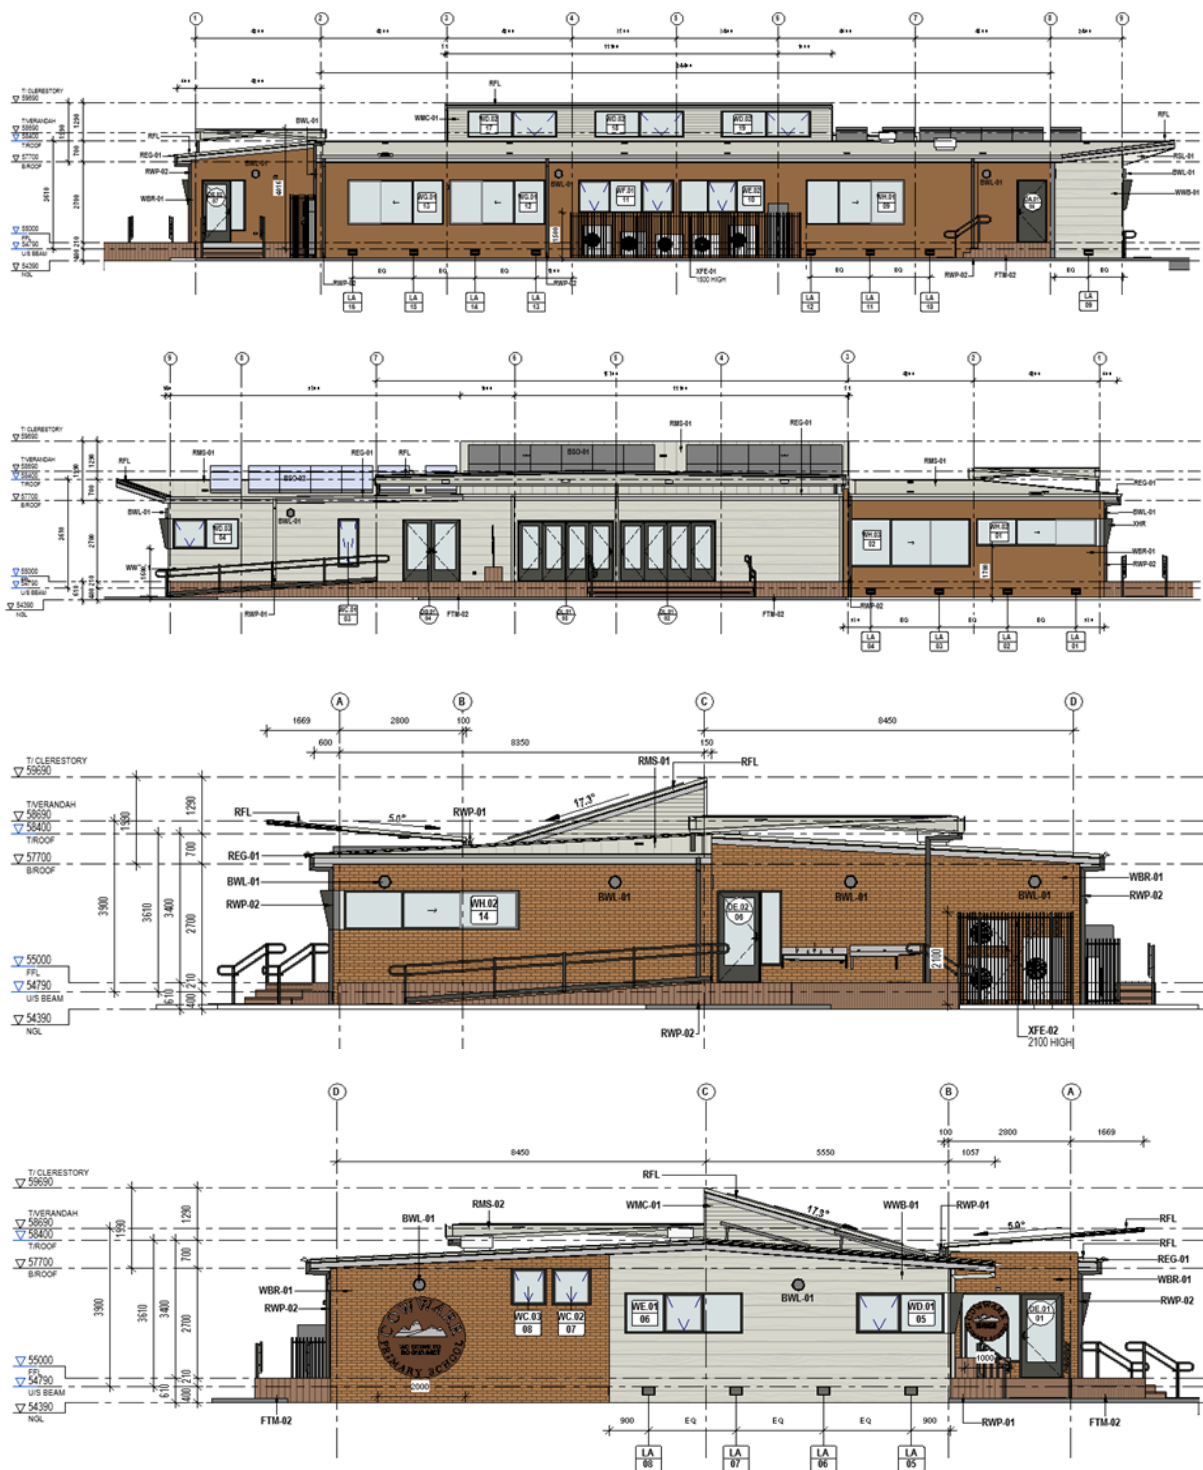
Elevations in order from top to bottom (North, South, West and East)
